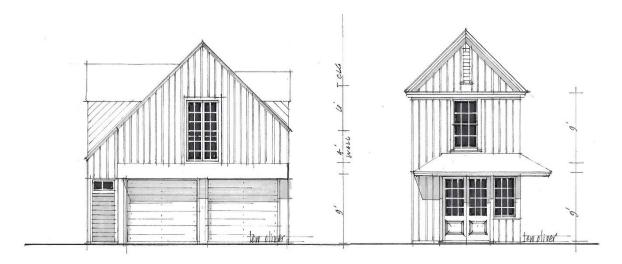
Examples of accessory dwelling units (a garage addition and an independent structure).
